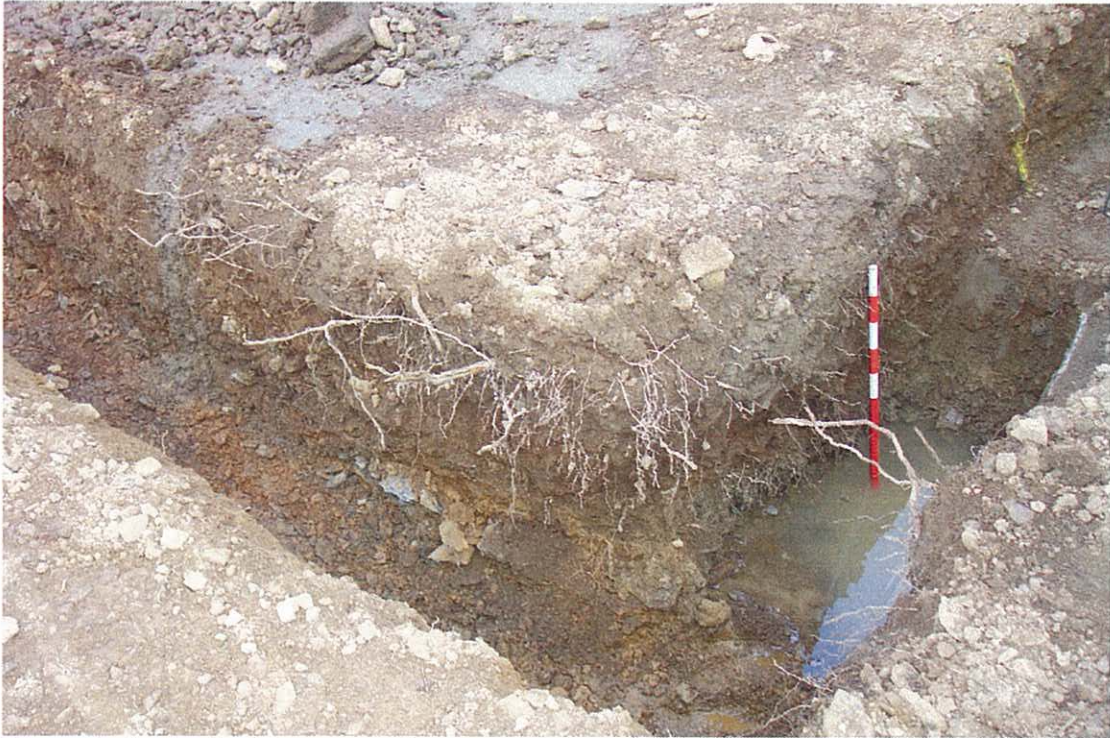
Spring in SE corner of garage footings. View NW. Scale 1m
